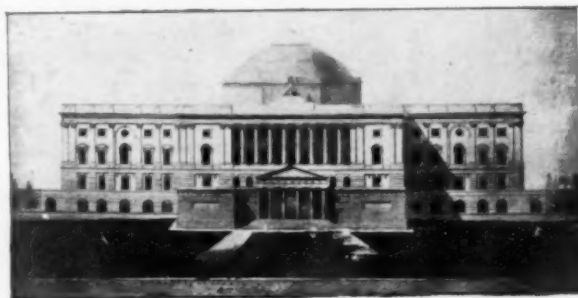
West Elevation: Drawing by Latrobe, 1811.
